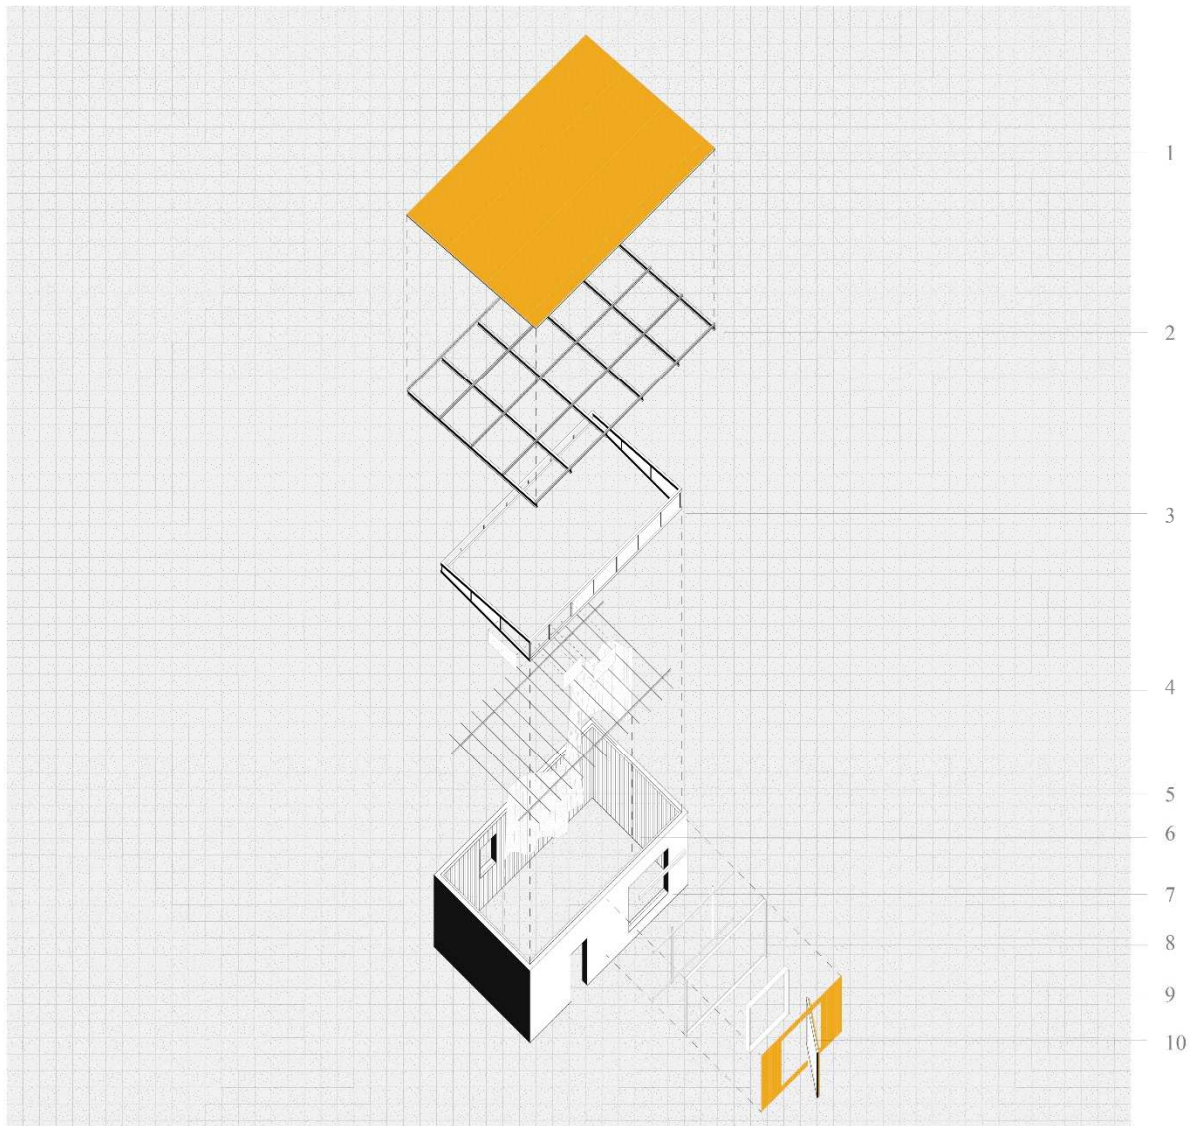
House prototype*, 1) Roof panels 2) Roof structure 3) High windows 4) Curtain frame 5) Curtains partition 6) Internal insulation 7) Existing Walls 8) Hanged structure 9) Panels 10) Screened window, Marco Giribaldo
